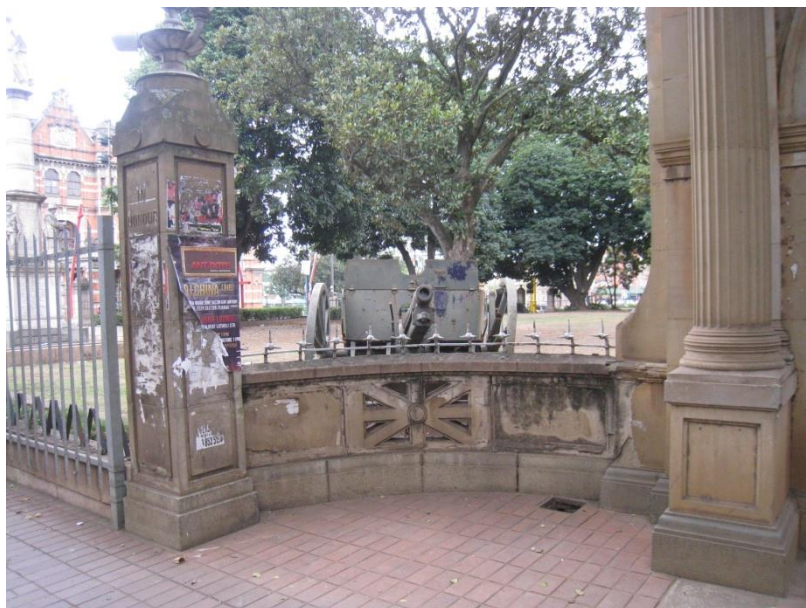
View along Albert Luthuli Street towards the Tatham Art Gallery. Note damage to stonework from lack of maintenance as well as damage through bill sticking
